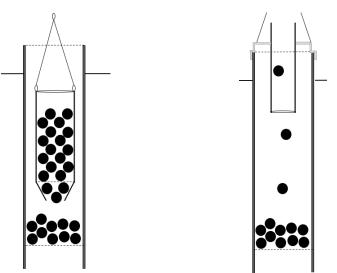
Installation Methodology (Left - Purpose Built Container | Right - Fall Pipe System)
